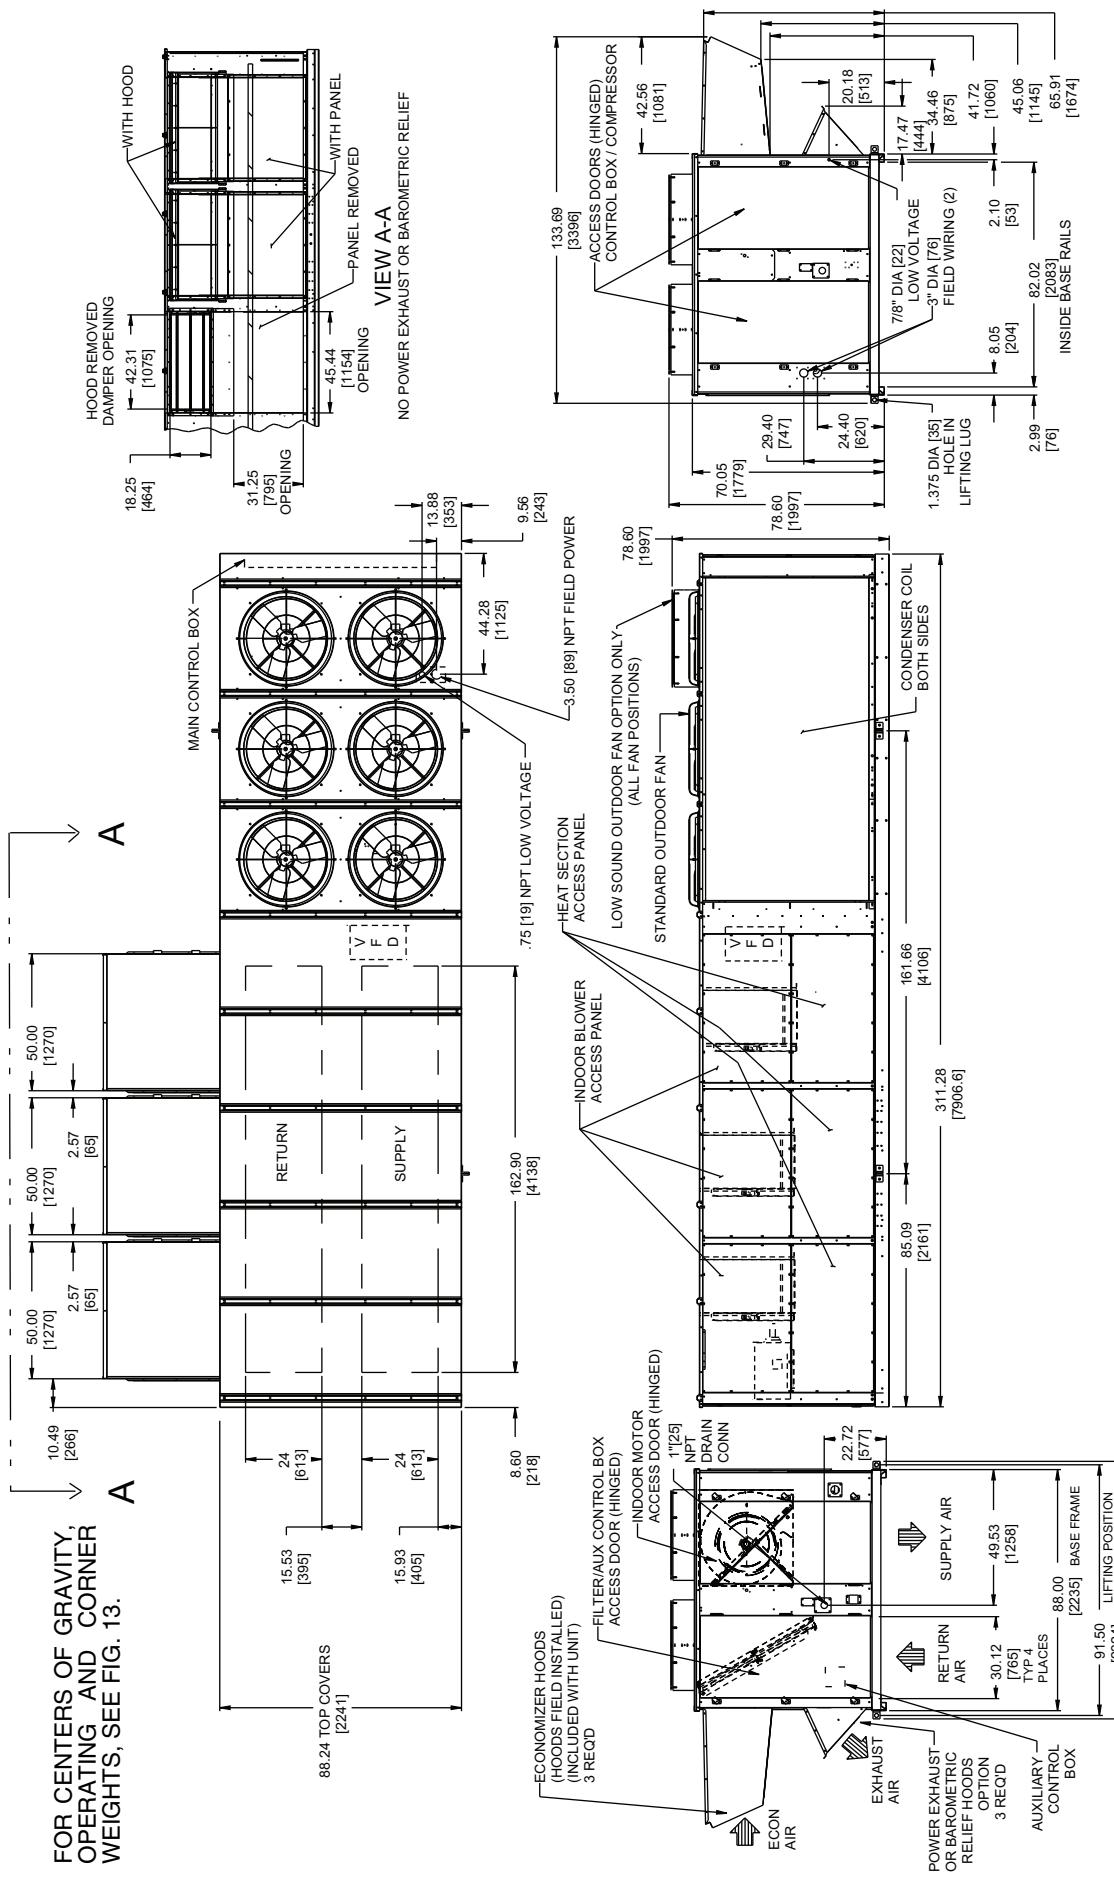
Base Unit Dimensions RTPF, CU Tube Condenser Bottom Supply and Return — 4A2, A3060
